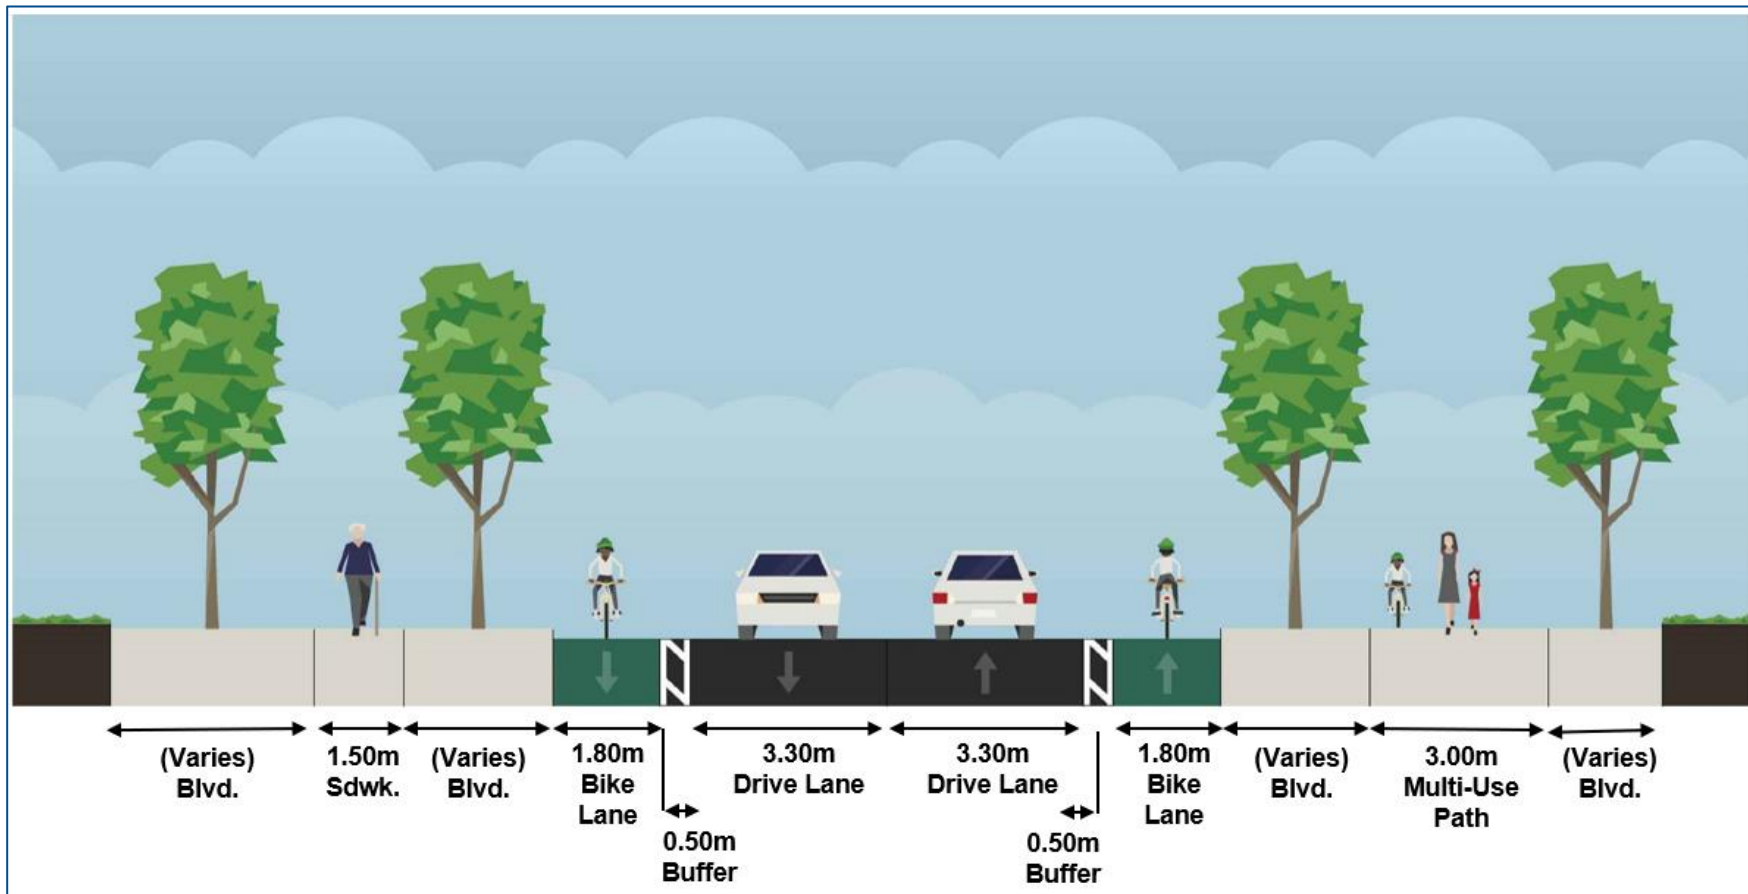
Third Line to Fourth Line Typical Cross-section
